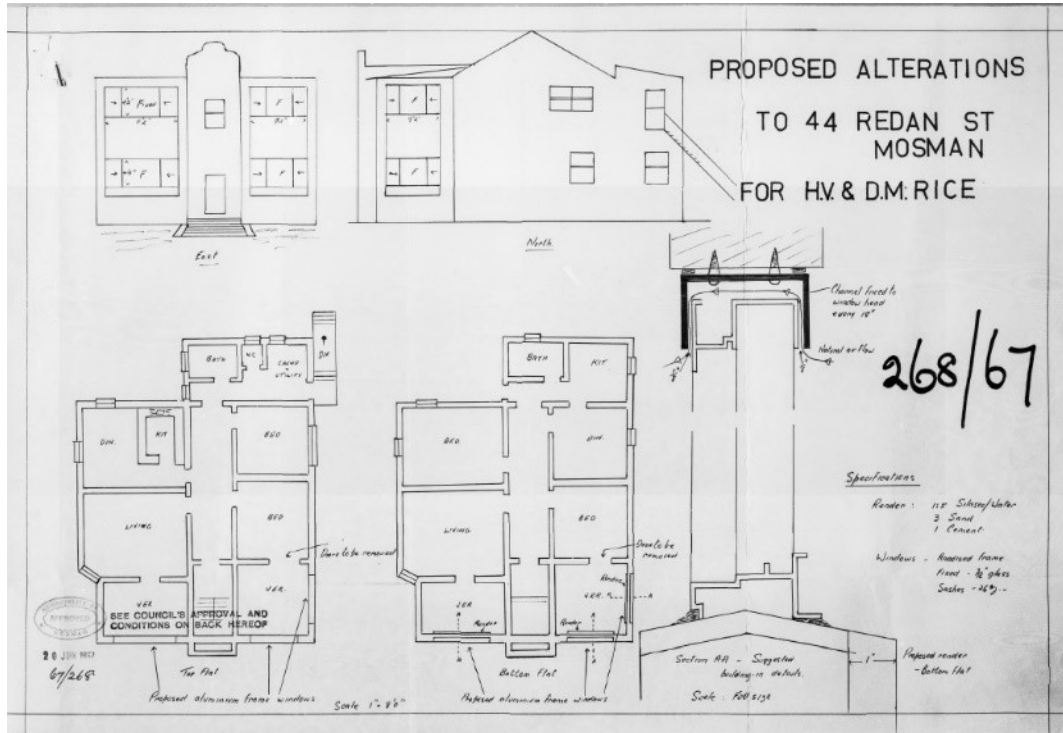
Archived Building Application 1979 for alterations to the flat. Plan shows a different eastern elevation façade to the present one.
